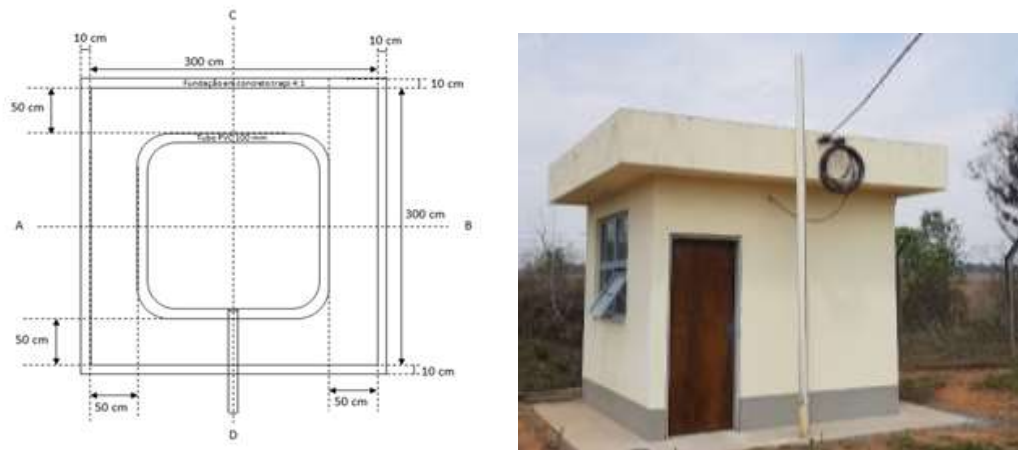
Floor plan of the building and soil depressurization system and dwelling prototype.
